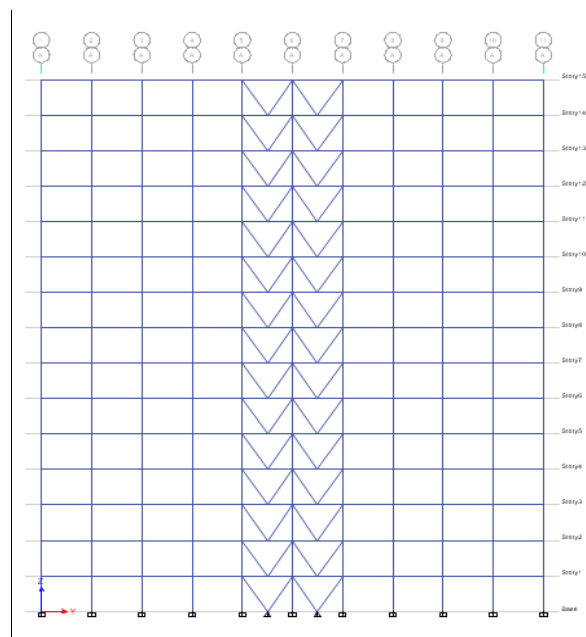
STRUCTURE WITH V-BRACING AT CANTER
